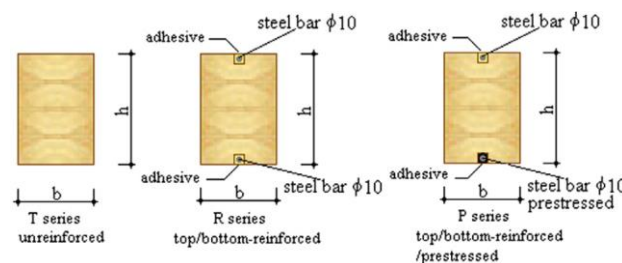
Details of the cross section types investigated by (De Luca and Marano 2012): unreinforced GLT beams; GLT beams with passive reinforcement (tension and compression) and; GLT beams with active reinforcement (tension) and passive (compression).
